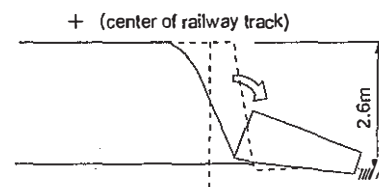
Typical damaged leaning-type unreinforced concrete RW; embankment along JR Tohkaido Line between Setsu-Motoyama and Sumiyoshi Stations
